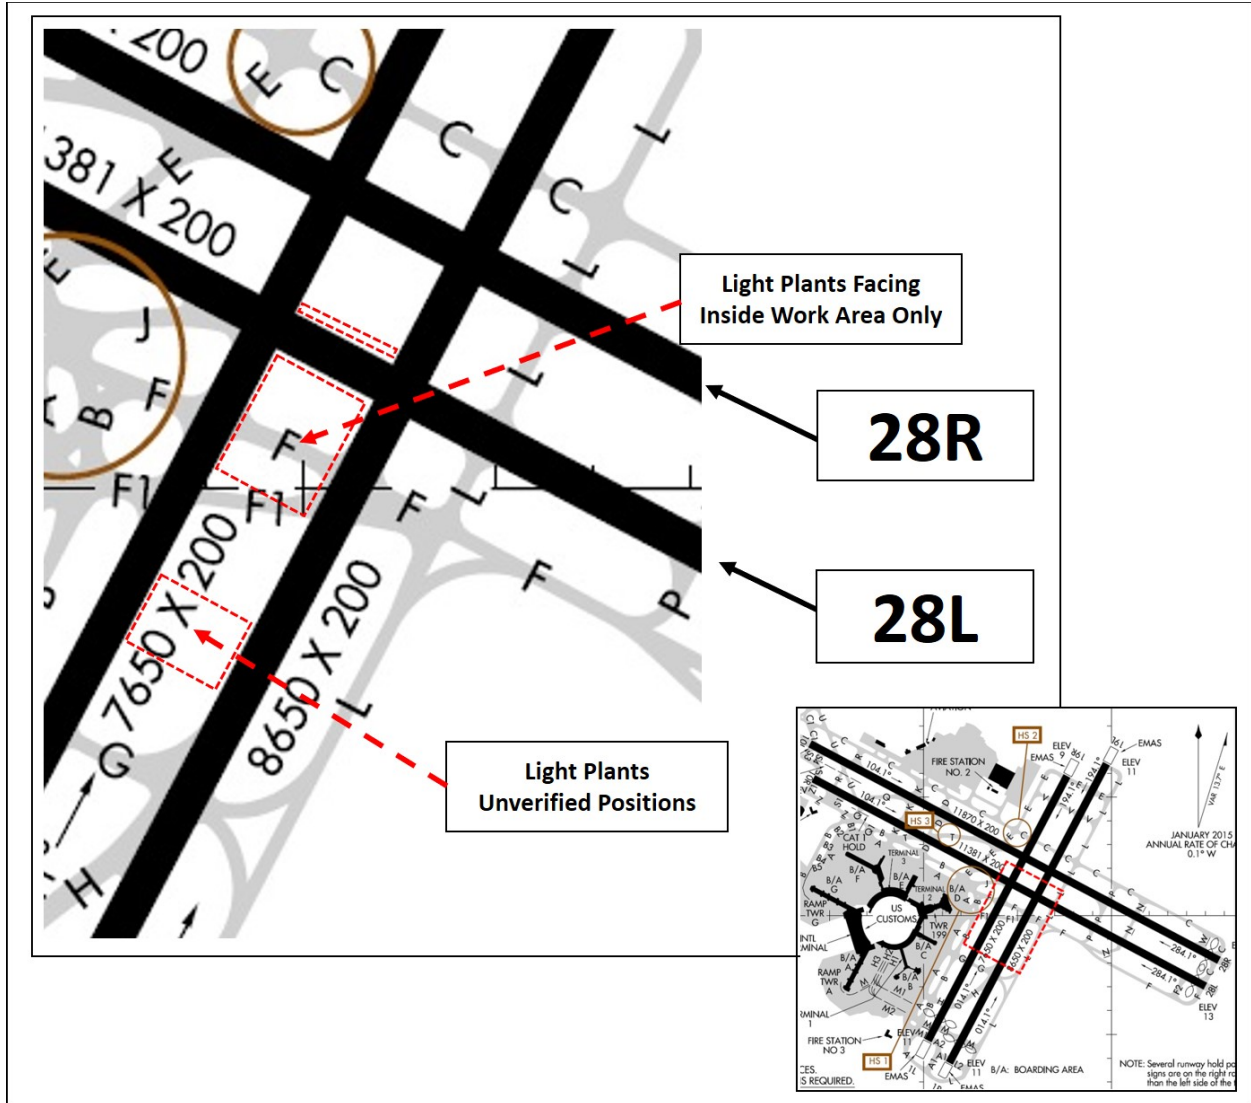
SFO runway 28L construction zone.<sup>14</sup>
